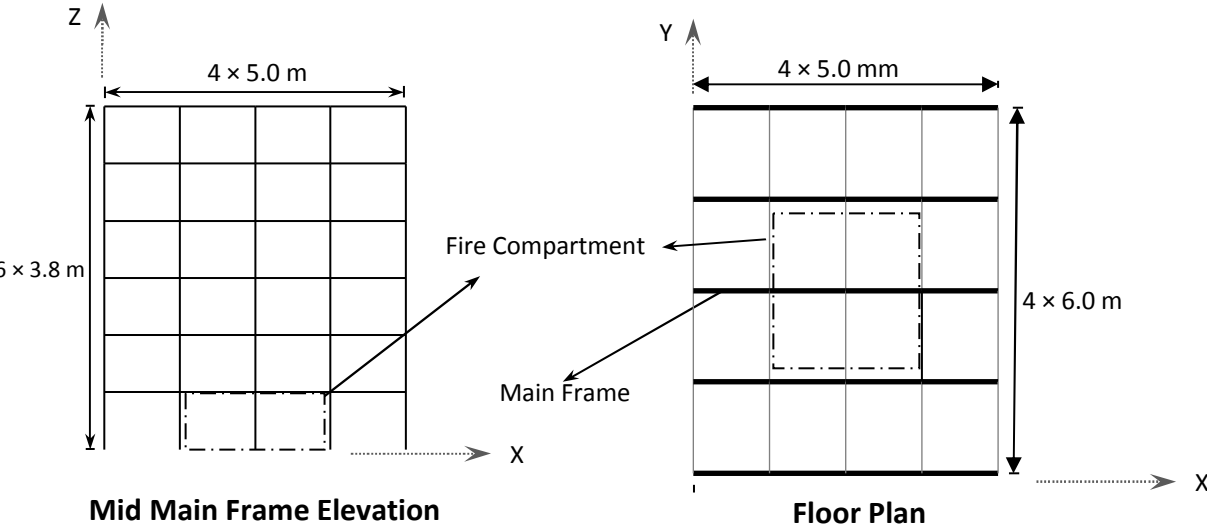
Elevation and Floor Plans of the Building Specimen.
